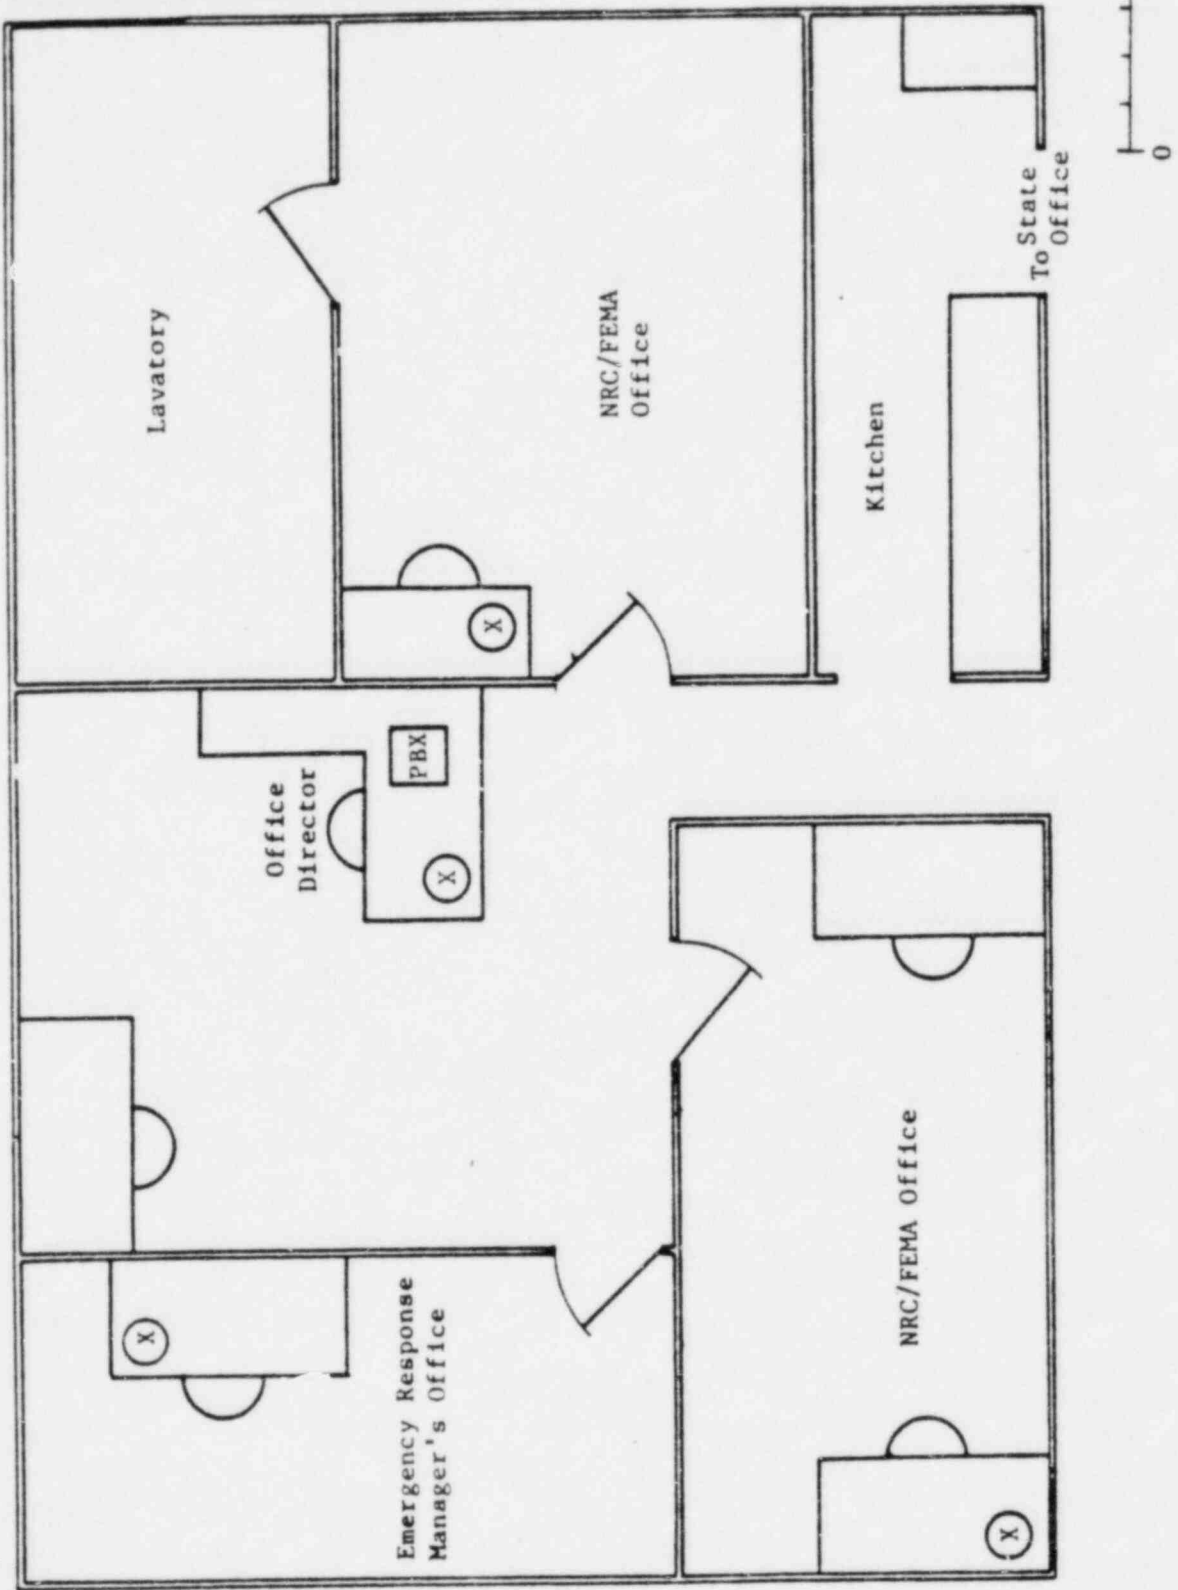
Floor Plan, EOF Dose Assessment Area
